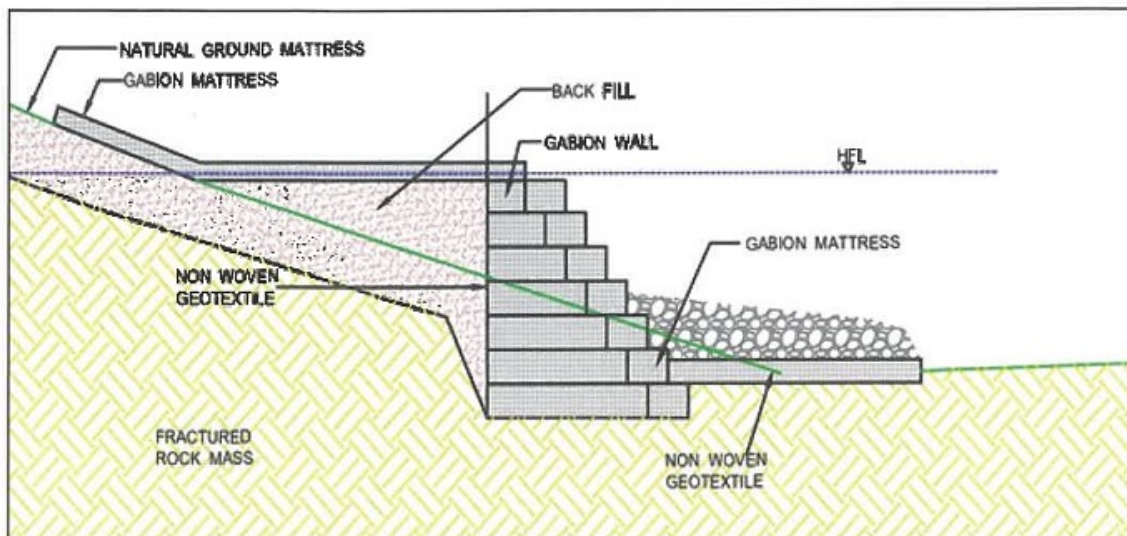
Indicative Cross-section of Gabion Retaining Wall
